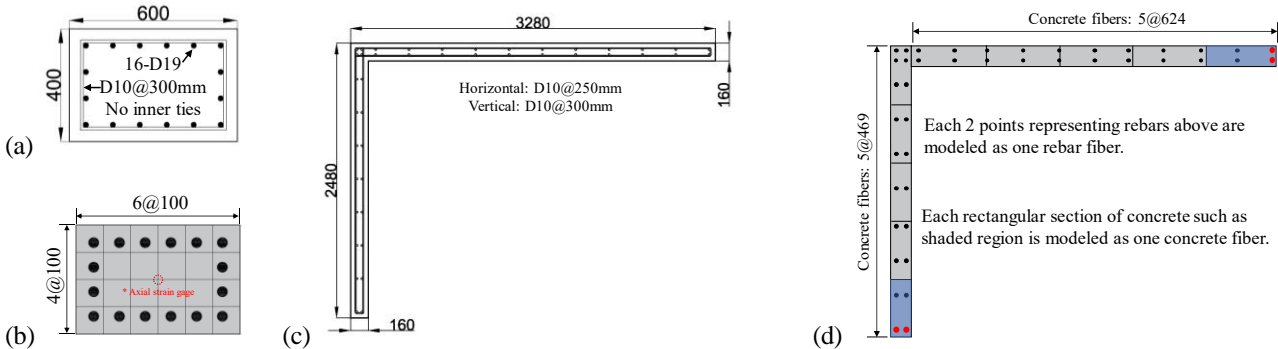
PERFORM-3D analytical model(mm): (a) cross section of column, (b) fiber model of column, (c) cross section of wall, (d) fiber model of wall.
